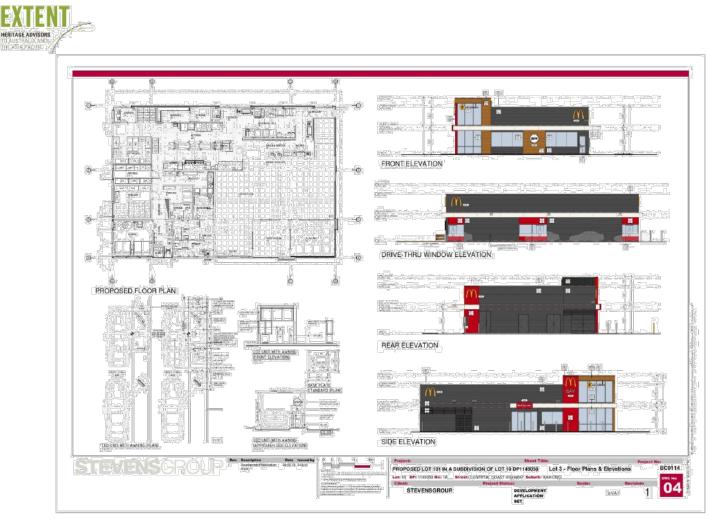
Floor plan and elevations of the MacDonald's Restaurant (source: Stevens Group; Project No. BC0114; Drawing No.04).
